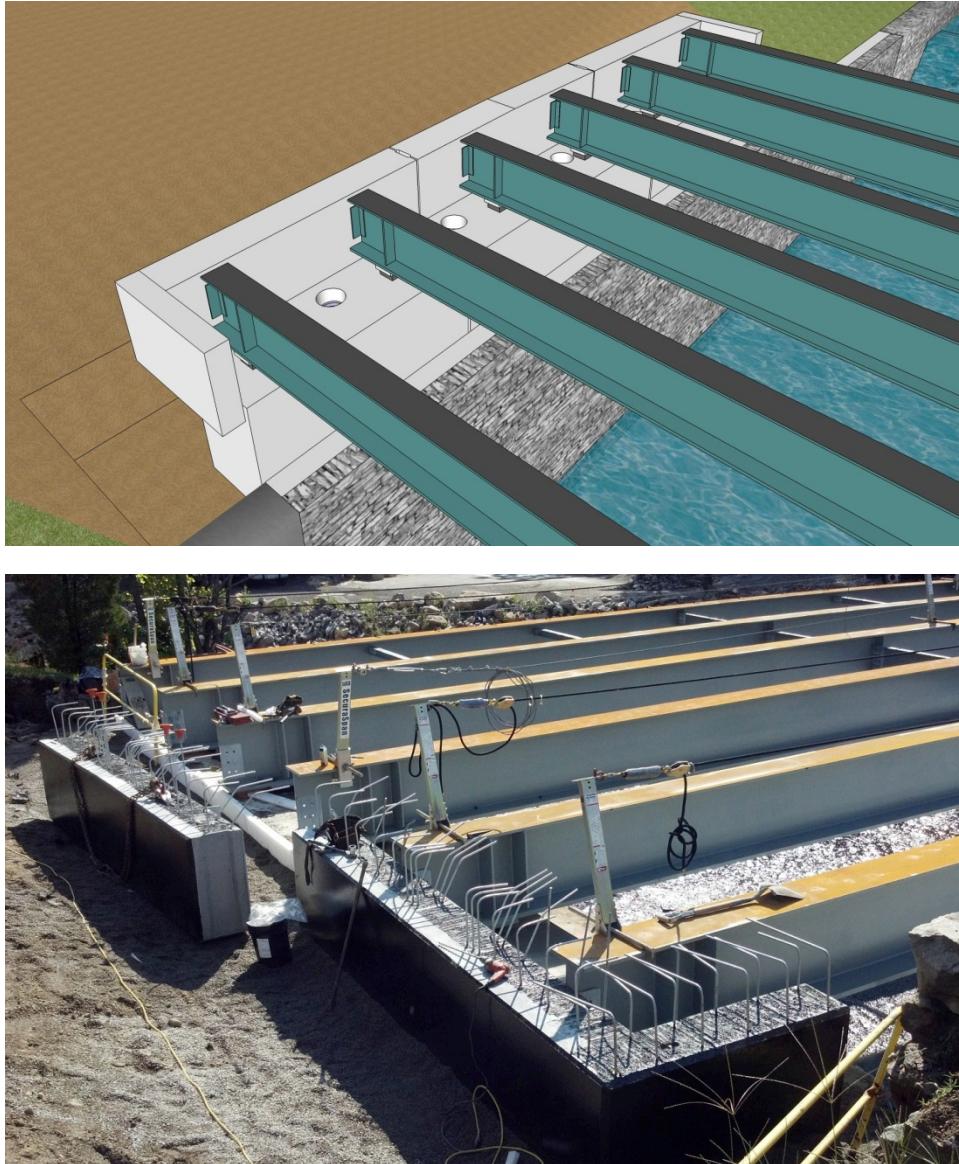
Semi-Integral Abutment Detail (Source: PCI Northeast).
